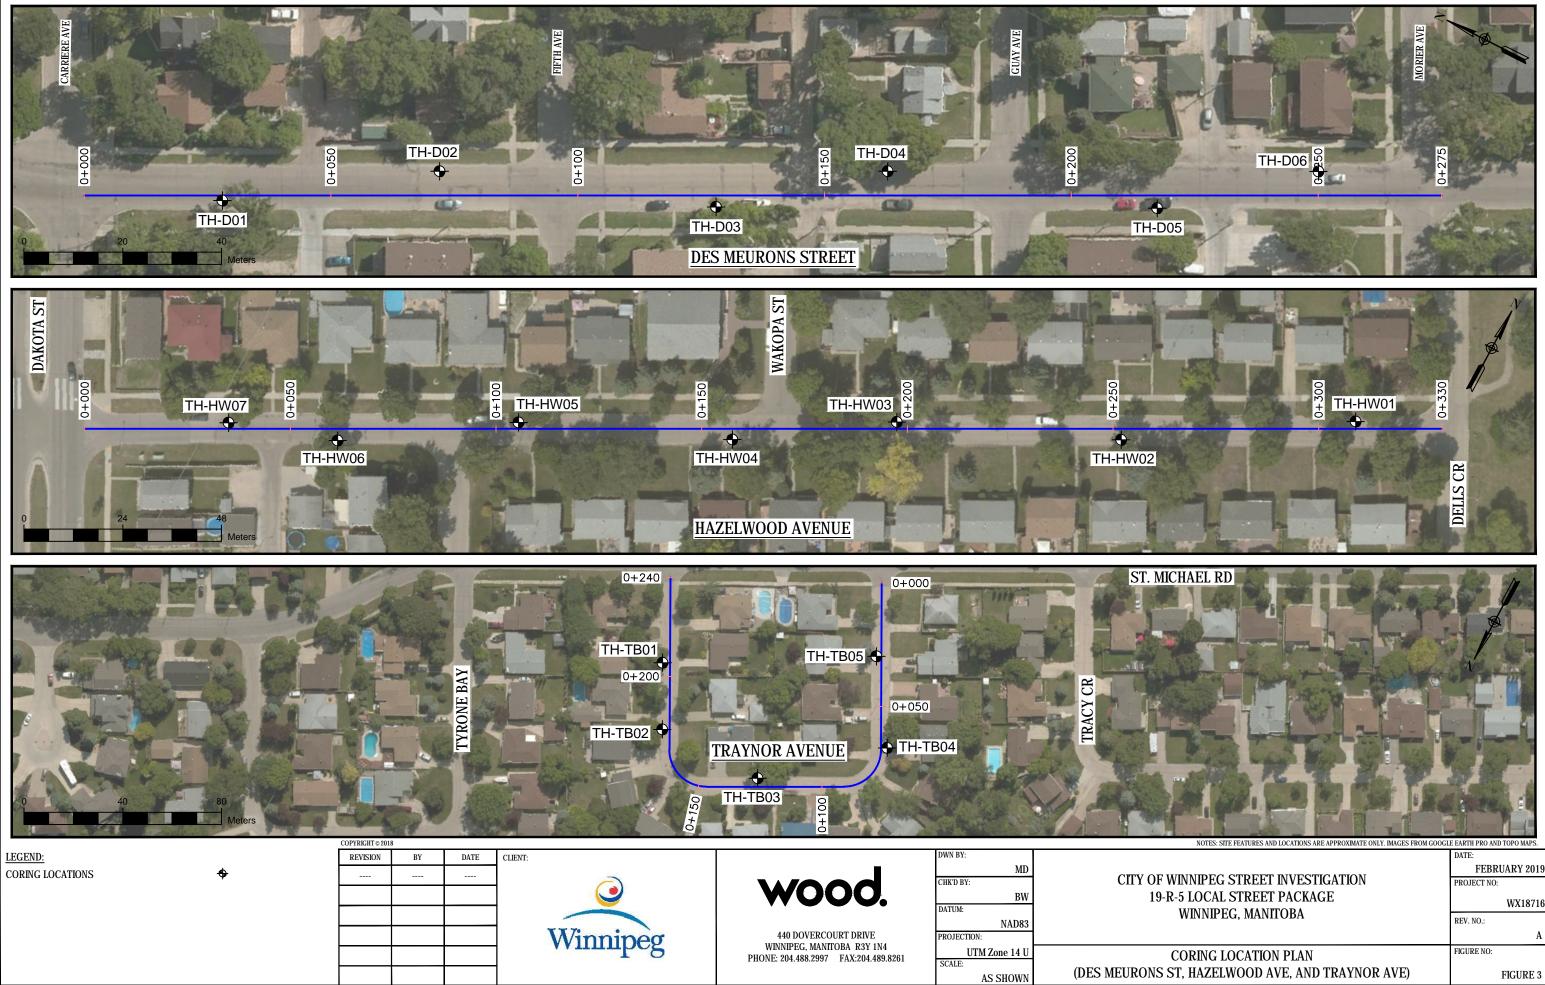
Coring Location Plan (Des Meurons Street, Hazelwood Avenue, and Traynor Avenue)
